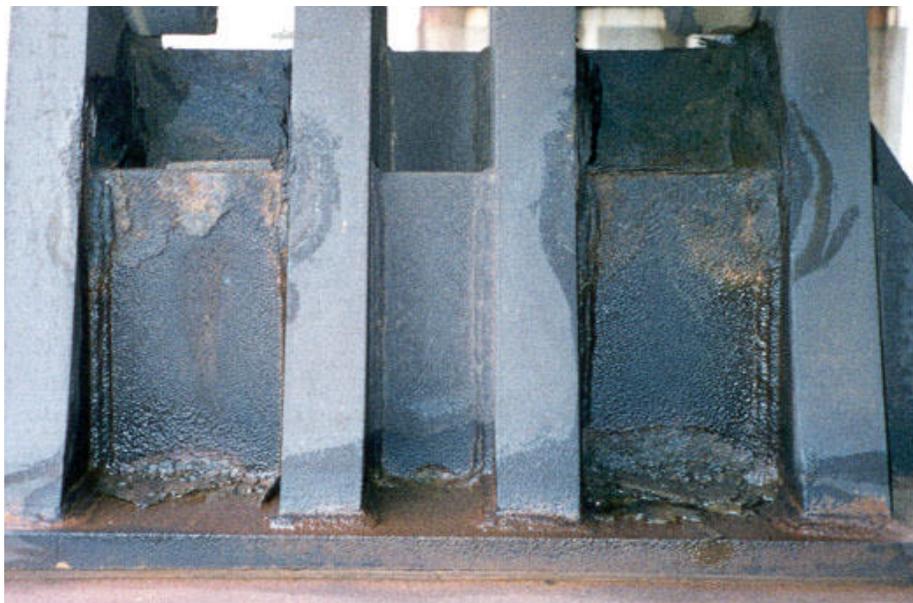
Detailing this area to include drain holes would have eliminated ponding
